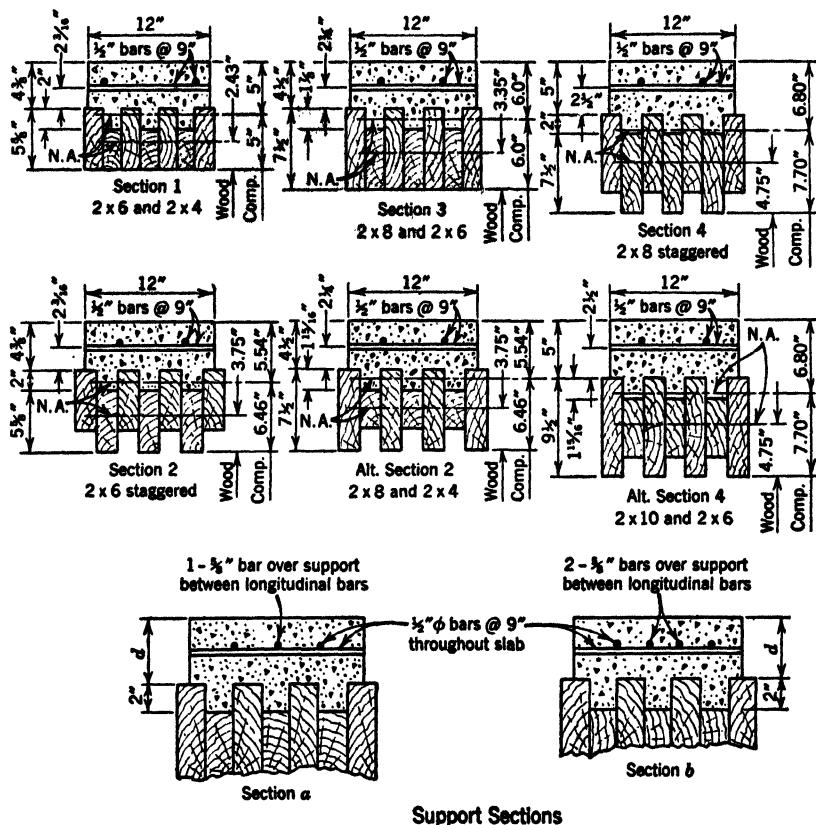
Arrangements of Timber, Concrete, and Reinforcing Steel in Timber-Concrete Construction.
